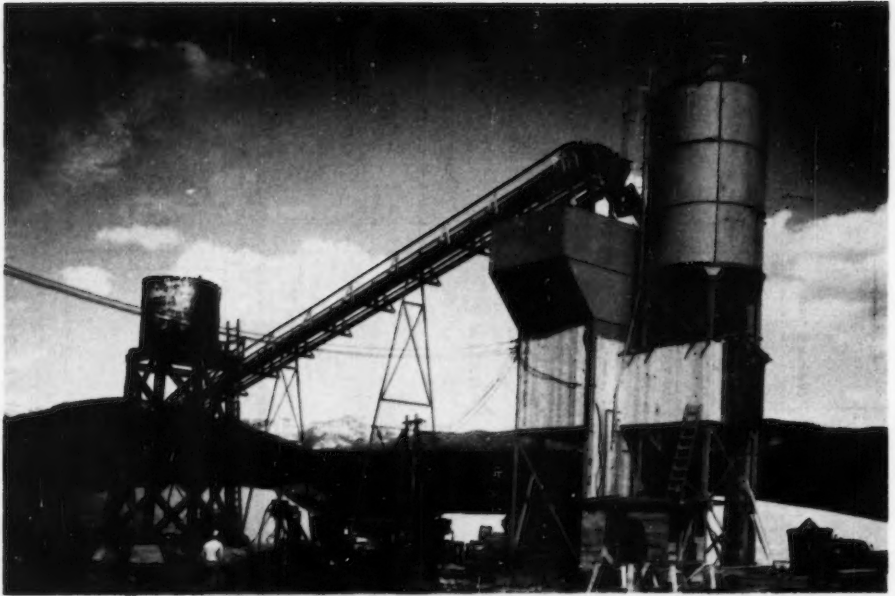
A fully automatic batching and mixing plant furnished all concrete for the work.
